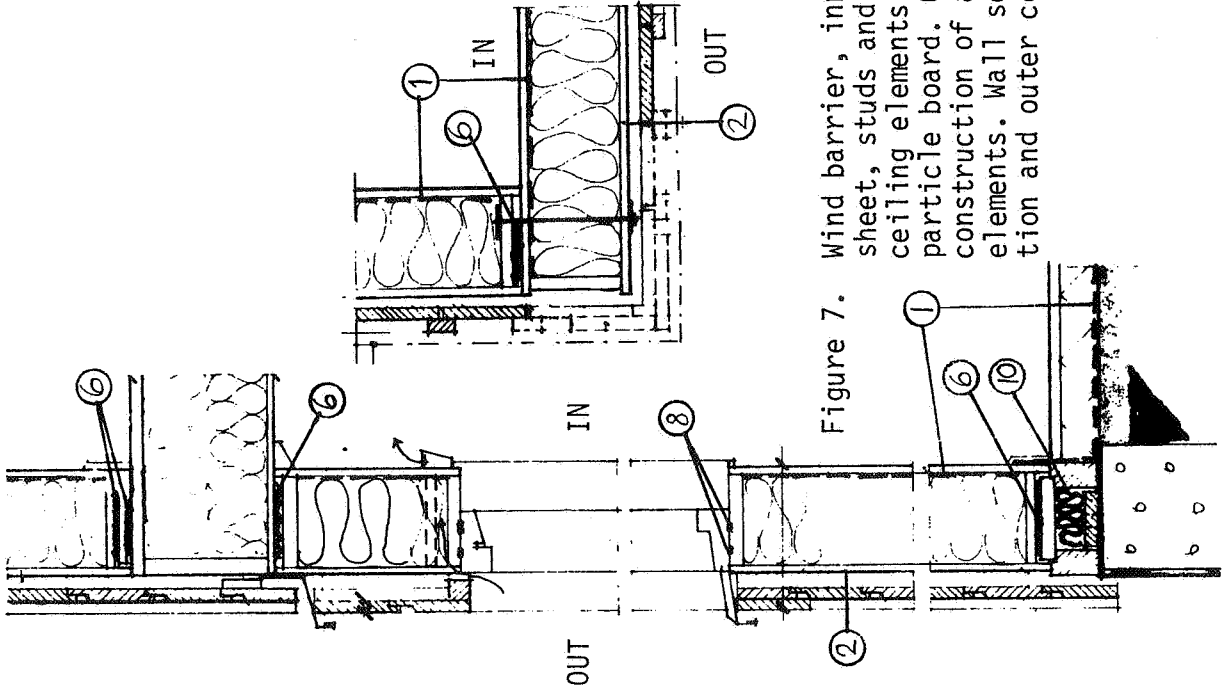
Wind barrier, inner sheet, studs and ceiling elements of particle board. Glued construction of all elements. Wall section and outer corner
